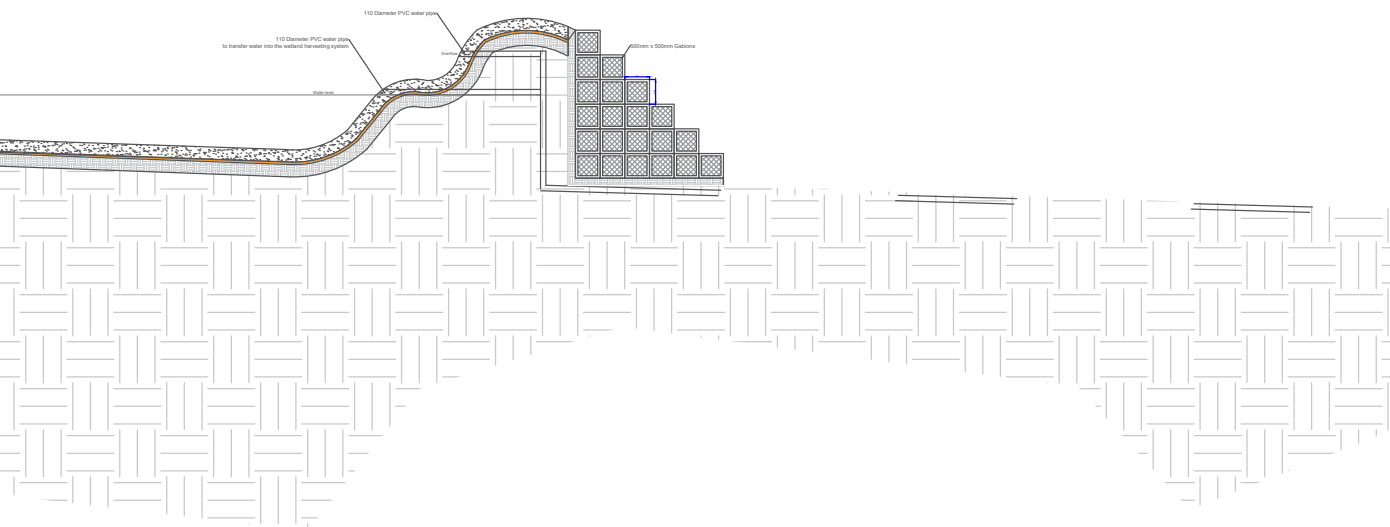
Section C-C - Detention dam (Author, 2018)
